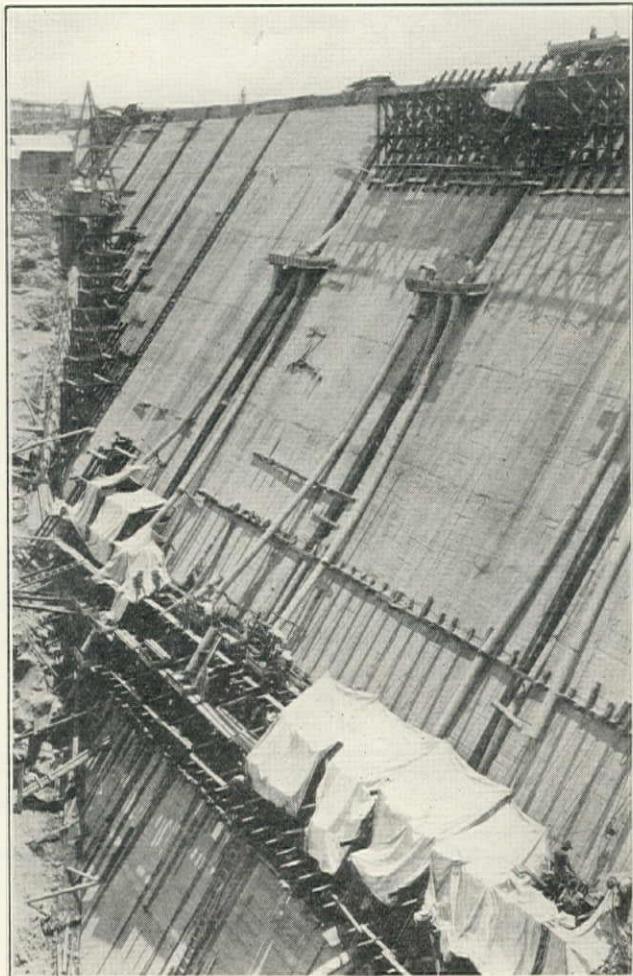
Placing First Layer of Impermeable Concrete on Upstream Face
